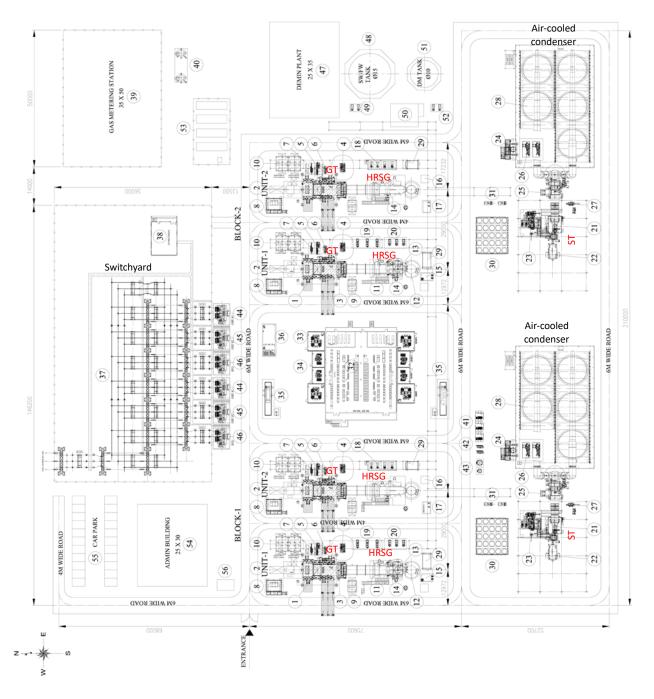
Typical GTCC Layout of 2 Blocks with Air Cooled Condenser System
